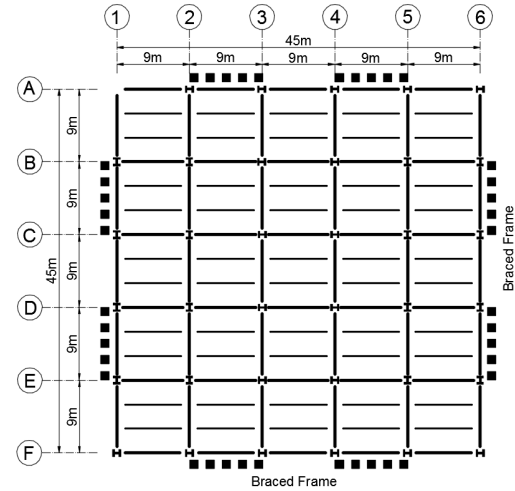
Plan of the 4-, 8-, 12- and 20-story buildings
